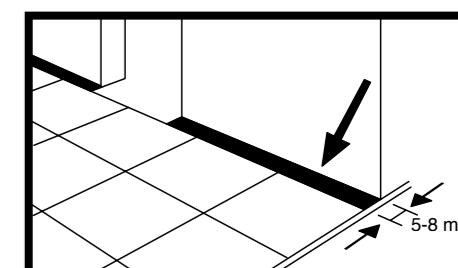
Around fixed elements of the supporting surface, such as walls, steps, columns, etc., it is mandatory to provide 5-8 mm peripheral joints.
